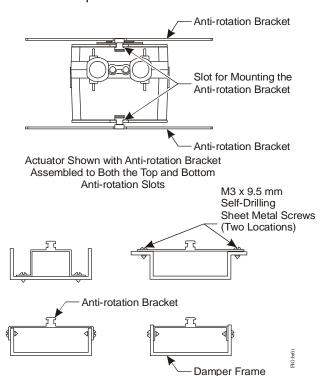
Fitting the Anti-rotation Bracket on the Damper Frame or Duct
